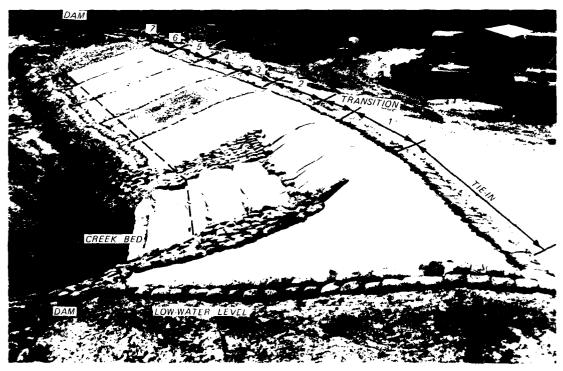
View (looking downstream) of the materials installed on Durden Creek (prior to removal of the dams)
